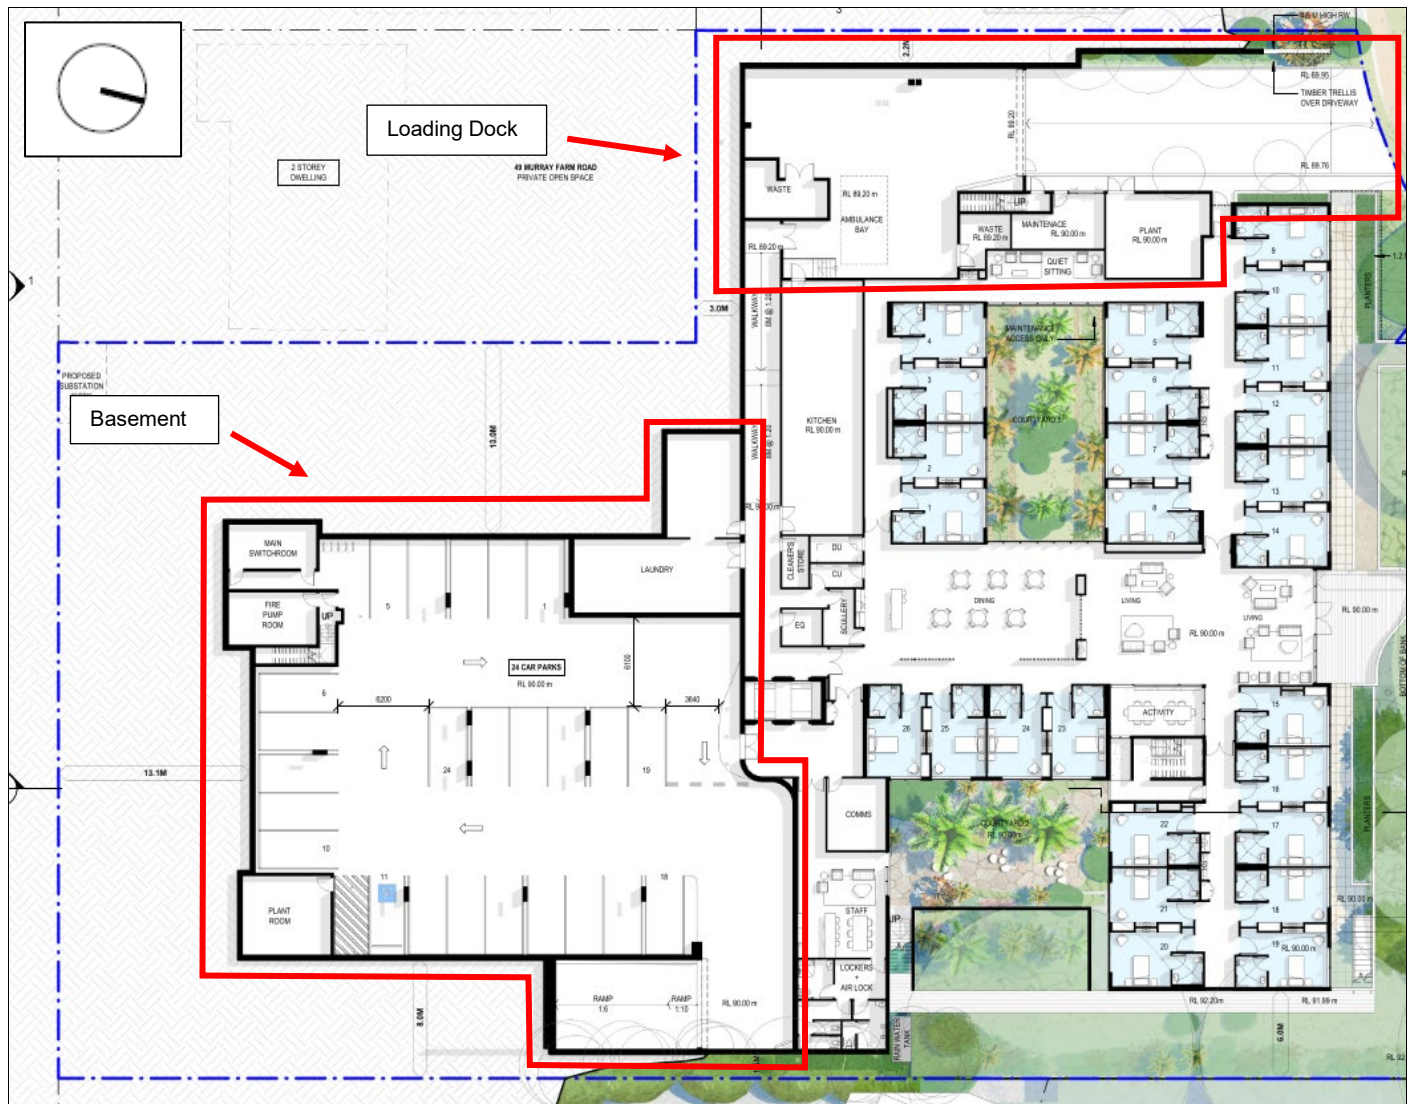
Proposed basement and loading dock. Outlined in red. Source: Thomas Adsett.
